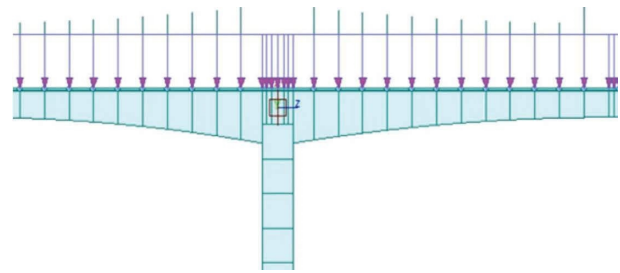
Calculation of the integral construction stage of the beam element model.
